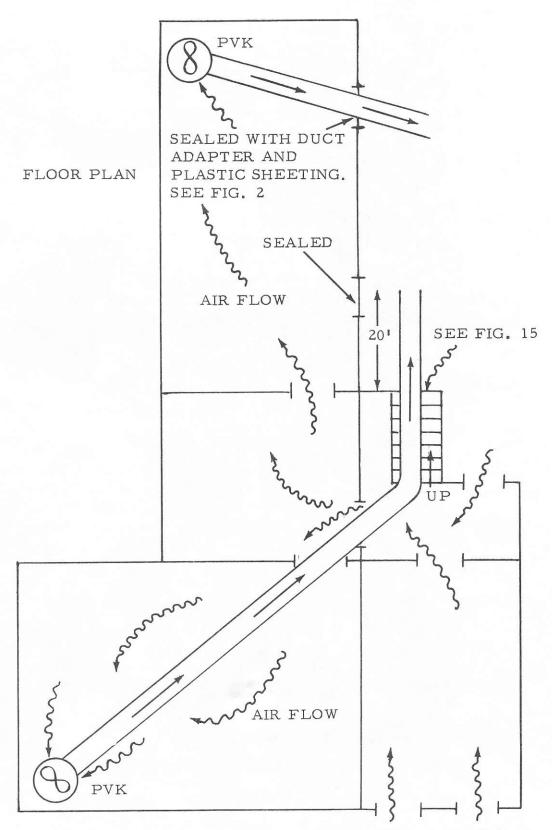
(Example B). — Typical multiroom basement shelter found in hospitals, apartments and public buildings.
